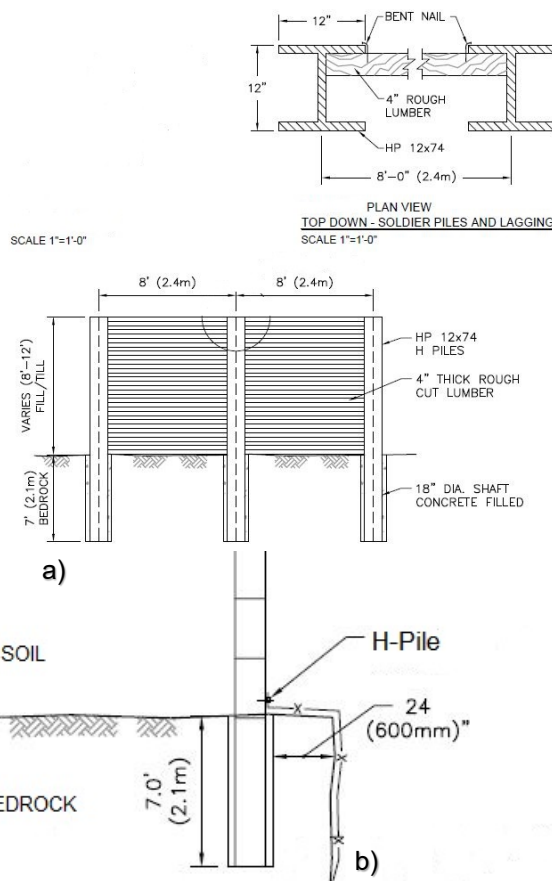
Proposed Soldier Pile and Lagging Design, Brenton Building; a). Elevation and Plan view, b.) Cross-Sectional View.
